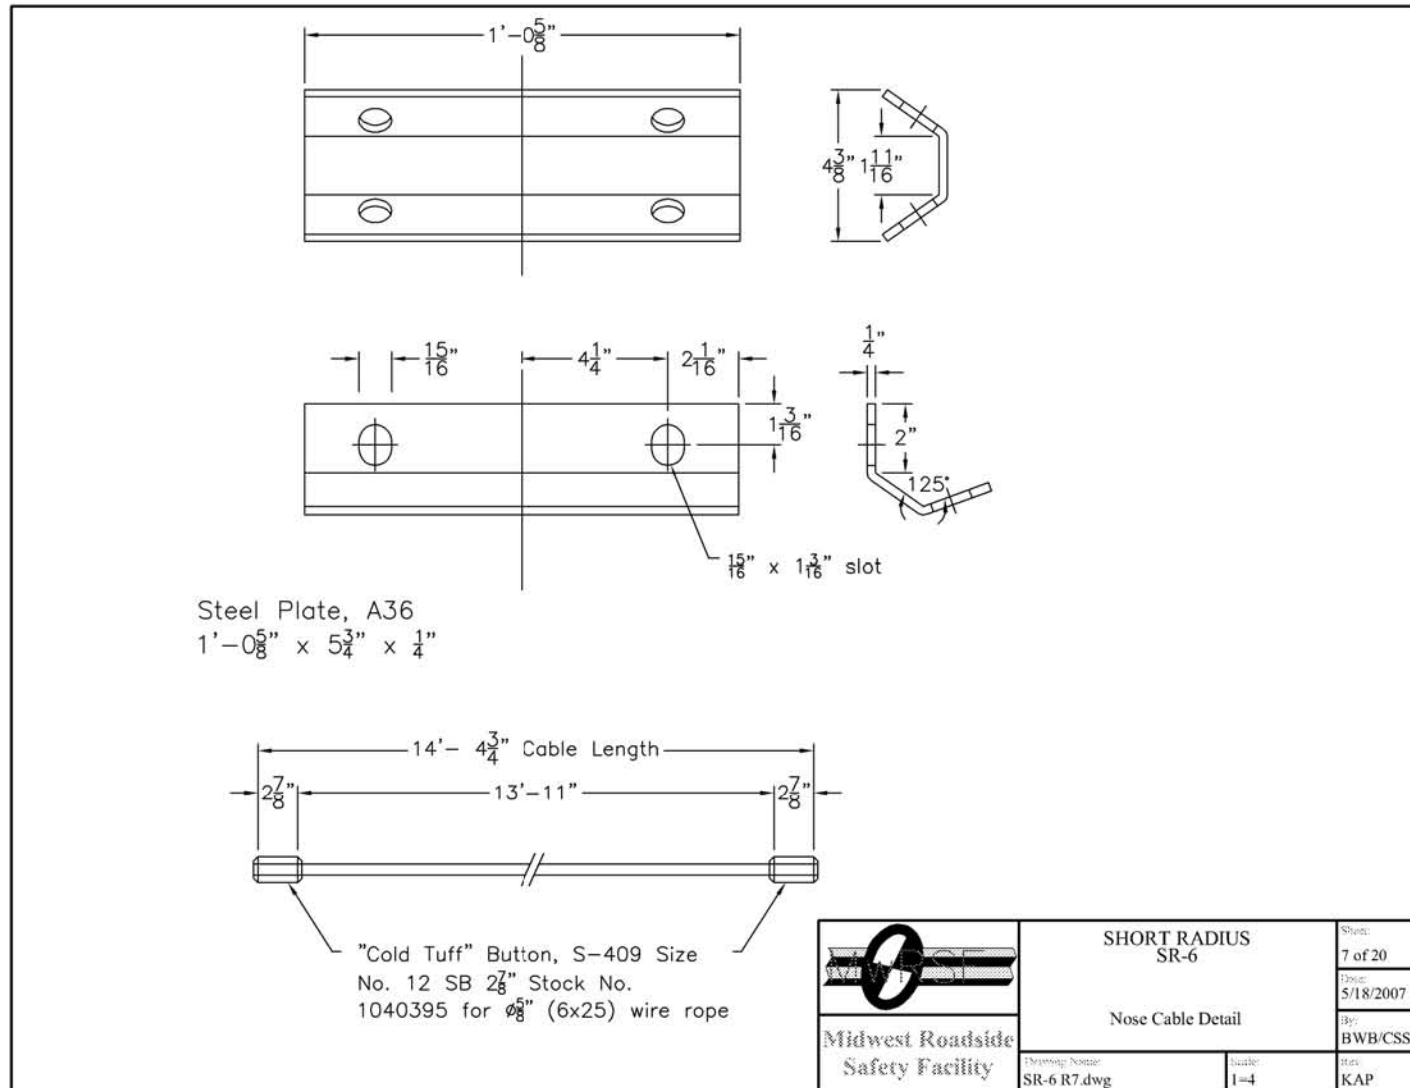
Nose Cable Anchor Plate Details (English), Test SR-6
